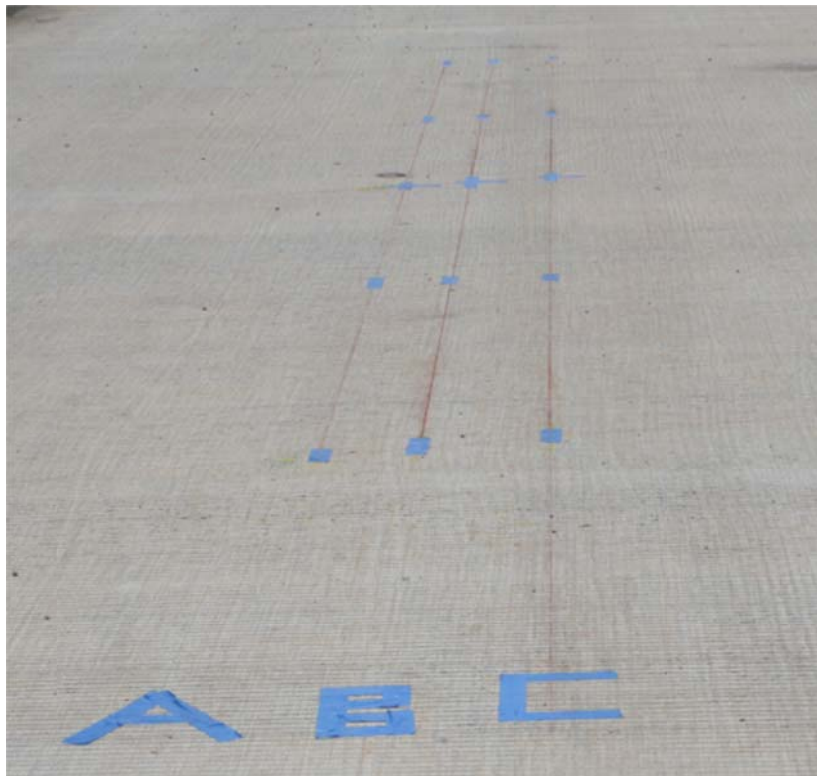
Load-truck placement markings on the bridge deck.
